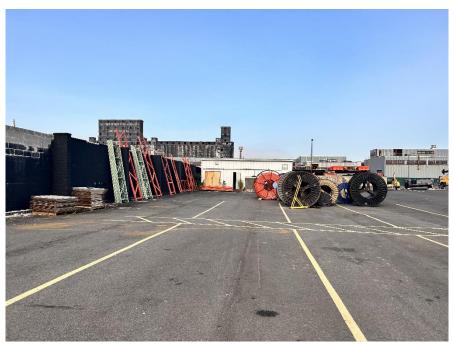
Remaining telecommunications equipment from previous tenant near the southern site boundary (facing north).
